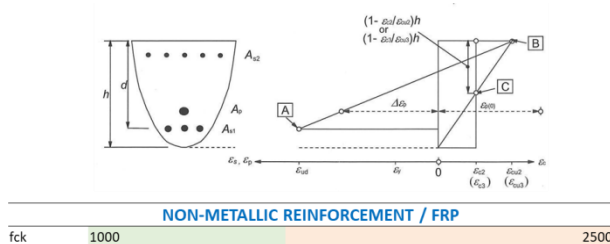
fib* MC 2010 model for bending extended for assessment of existing structures or for design of new structures or interventions on existing structures. Use of non-metallic reinforcement.
